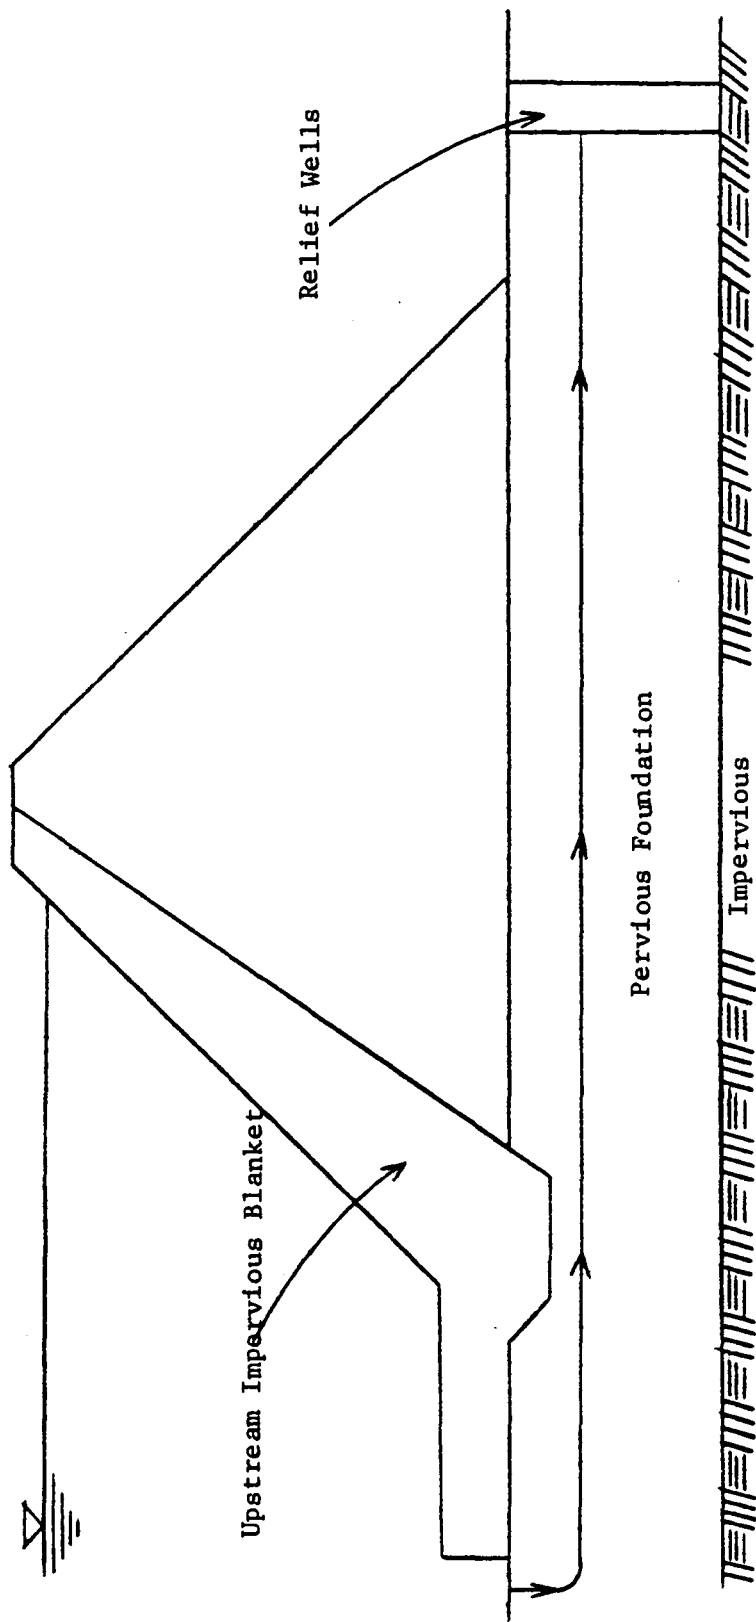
Typical relief wells, used to control seepage under the dam.
